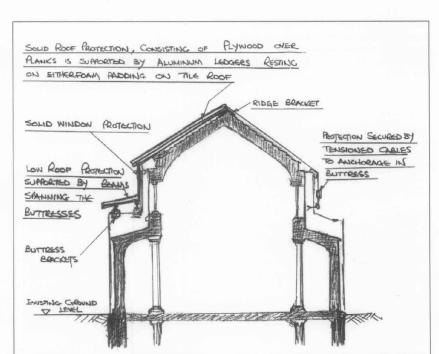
Before new construction was undertaken to the left of this church, a subcontractor was hired to design a protective system for the tile roof and clerestory windows. Drawing: Alan Shalders, Universal Builders Supply, Inc.
